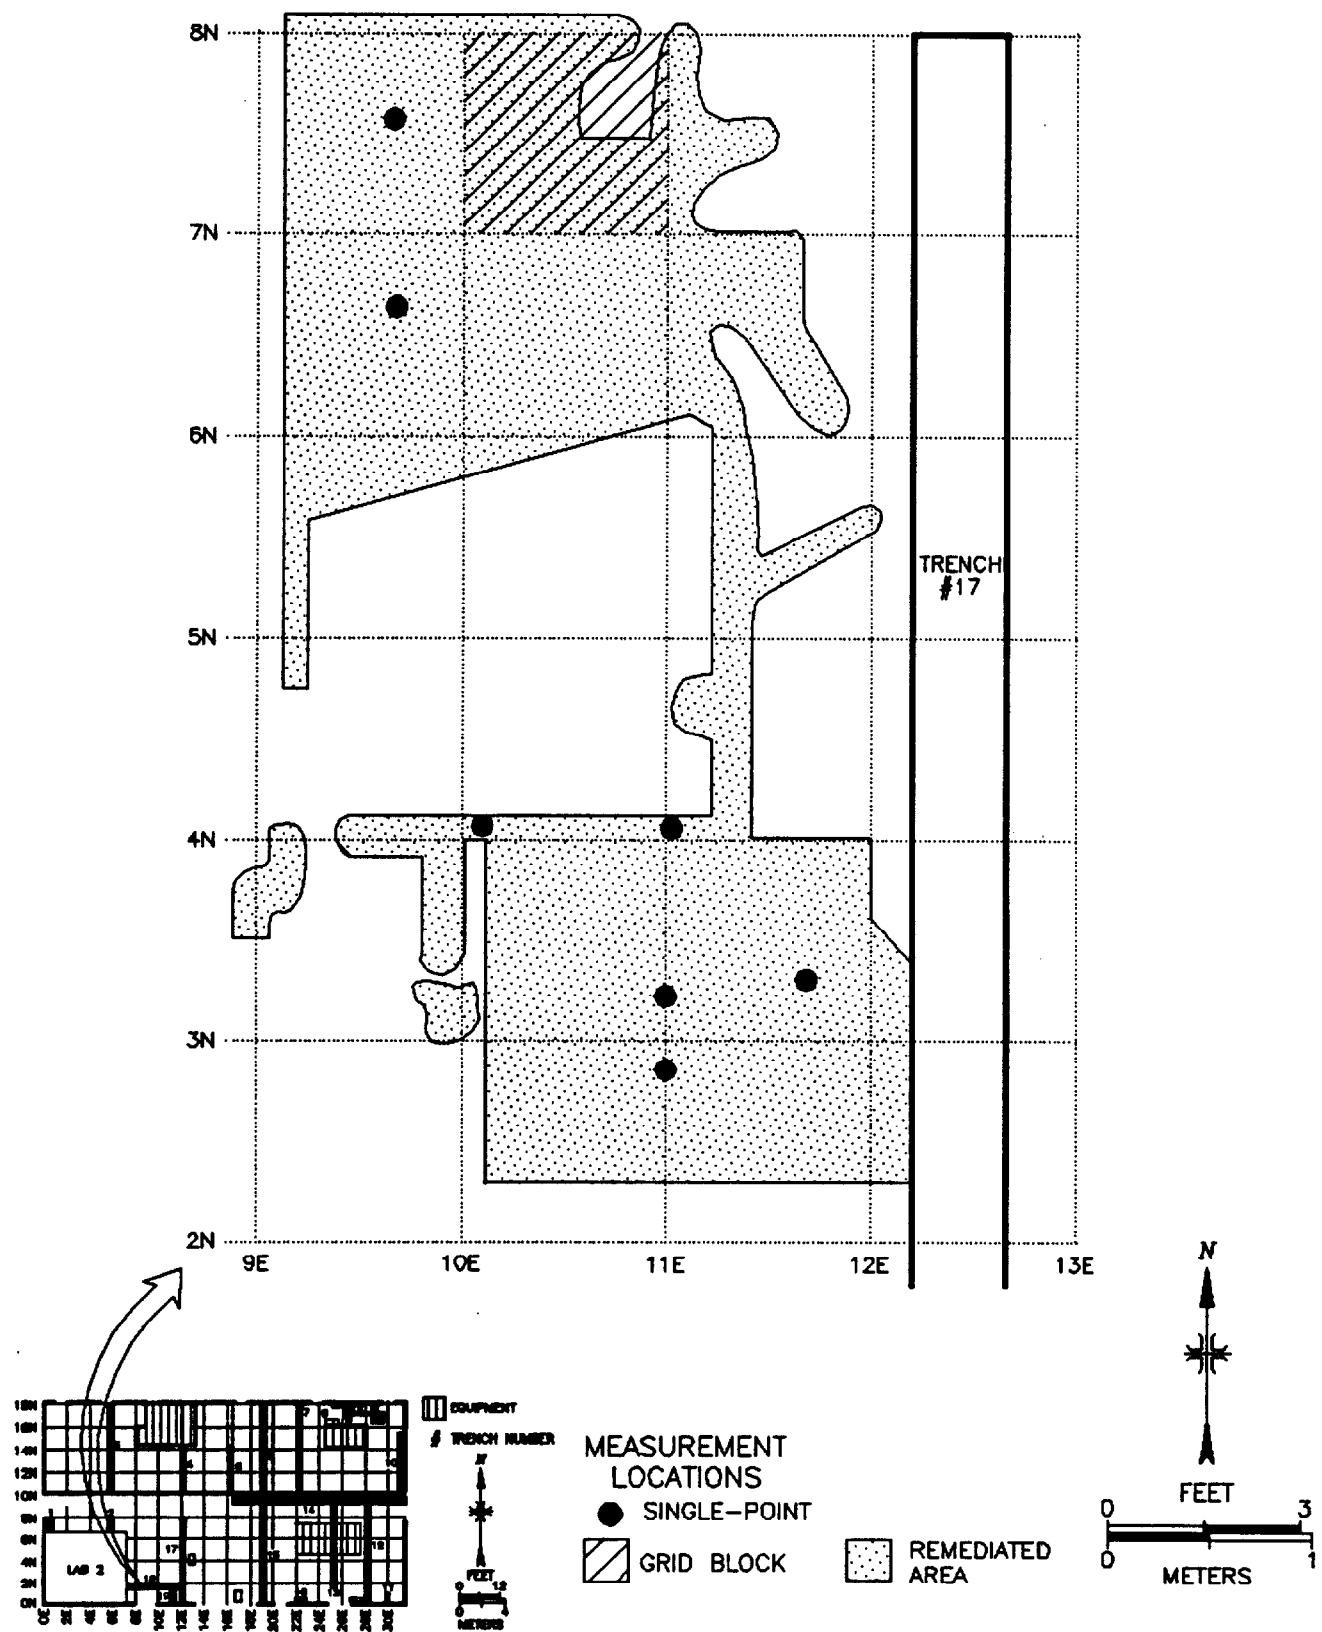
Building 23, Lab 1, Floor North of Thorium Room – Remediated Areas and Measurement Locations
